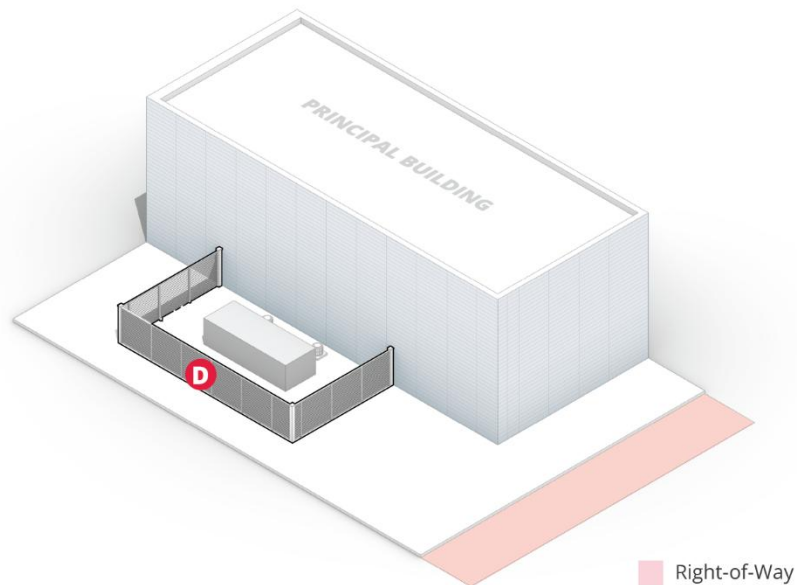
Ground- and/or Wall-Mounted Building Mechanical Equipment
